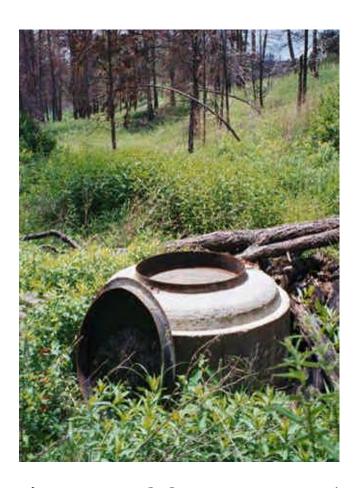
Manhole Structure at Seep/Spring near former Michaud Hotel Site (source: $QE|A\ 2003$, Roll1 AA007A)
